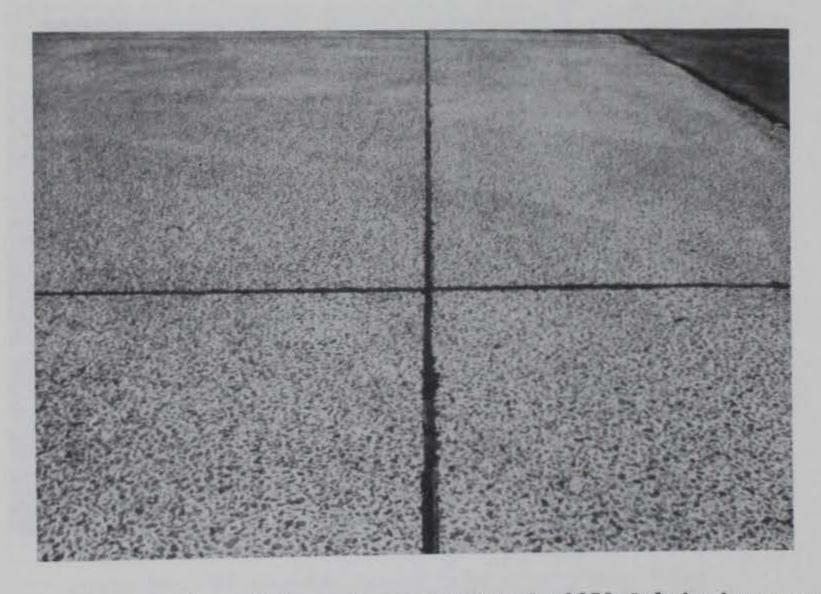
Typical condition of sawed joint in 1979 Salviacim pavement
